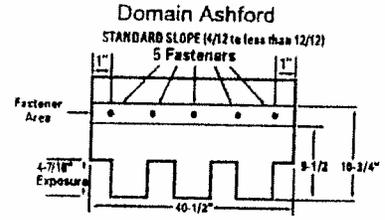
TYPICAL INSTALLATION DETAILS (Continued)
